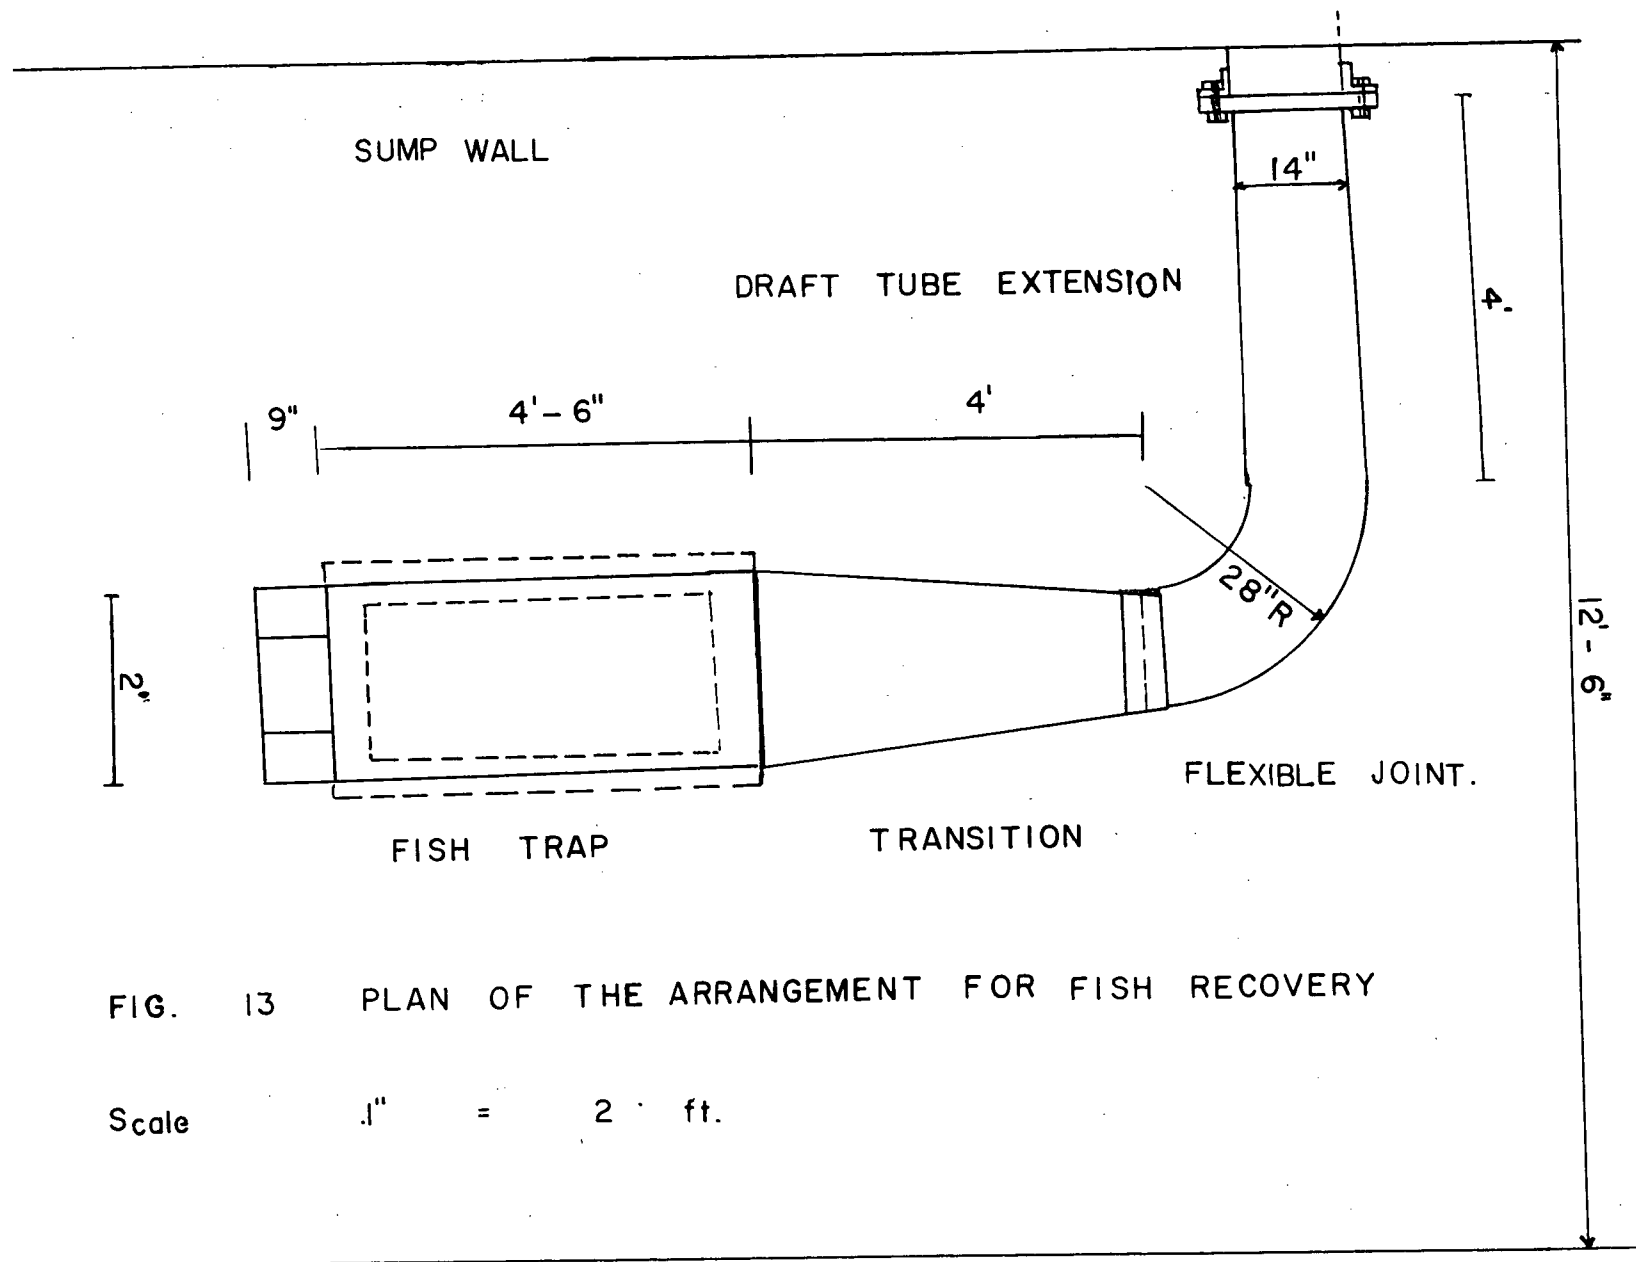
PLAN OF THE ARRANGEMENT FOR FISH RECOVERY
